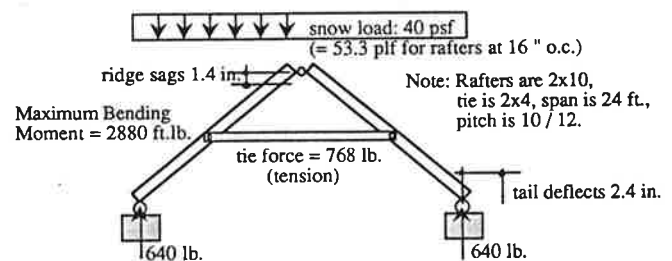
Two rafters, configuration 2, supported vertically at top of wall and tied with a collar tie.
